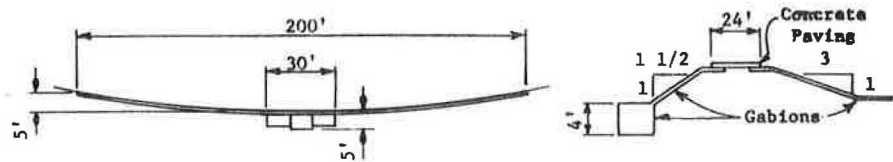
Elevation view of weir (left) and road cross section at weir (right).
